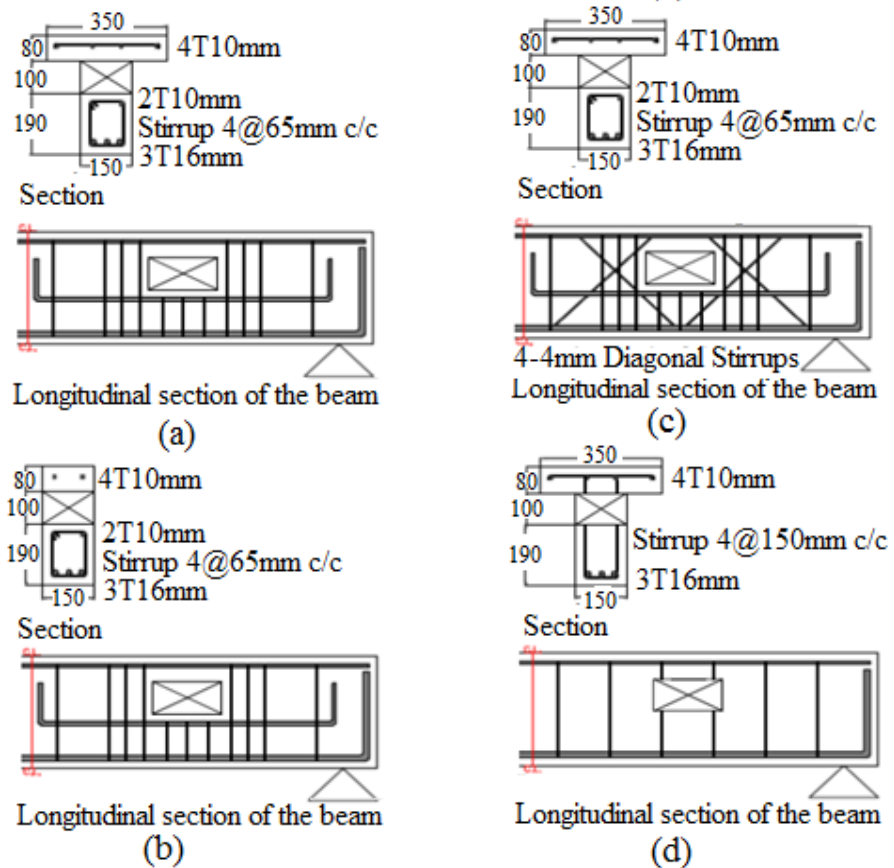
Detail of; (a) T1, TS1, and TP1 beams (b) R1 beam (c) TX1 beam (d) AS1 beam
